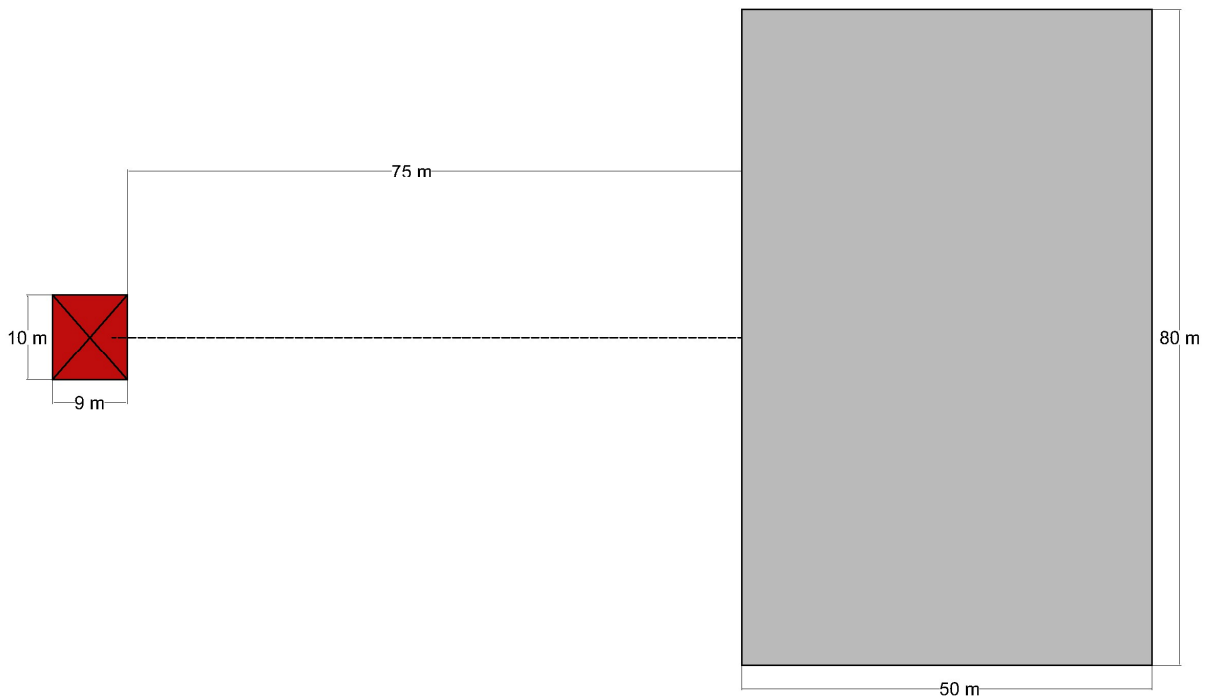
Plan of the “source building” (red), and “target façade” (grey) that is to be designed. Mean roof height is 10 m and one roof tile trajectory is reported with the dashed line.
